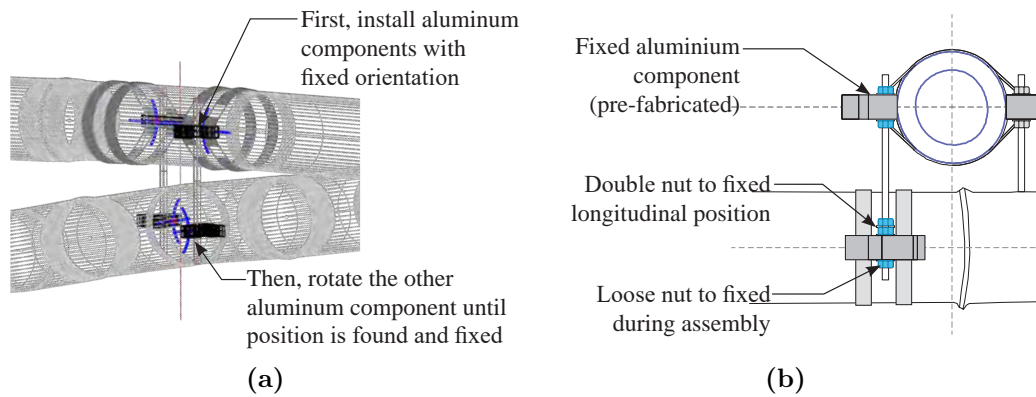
(a) Steps to assemble aluminium connection. (b) Double nut to allow rotations or aluminium component.
